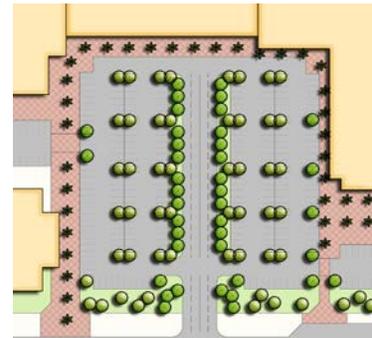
Pedestrian circulation is consistent along perimeter of parking lot.
